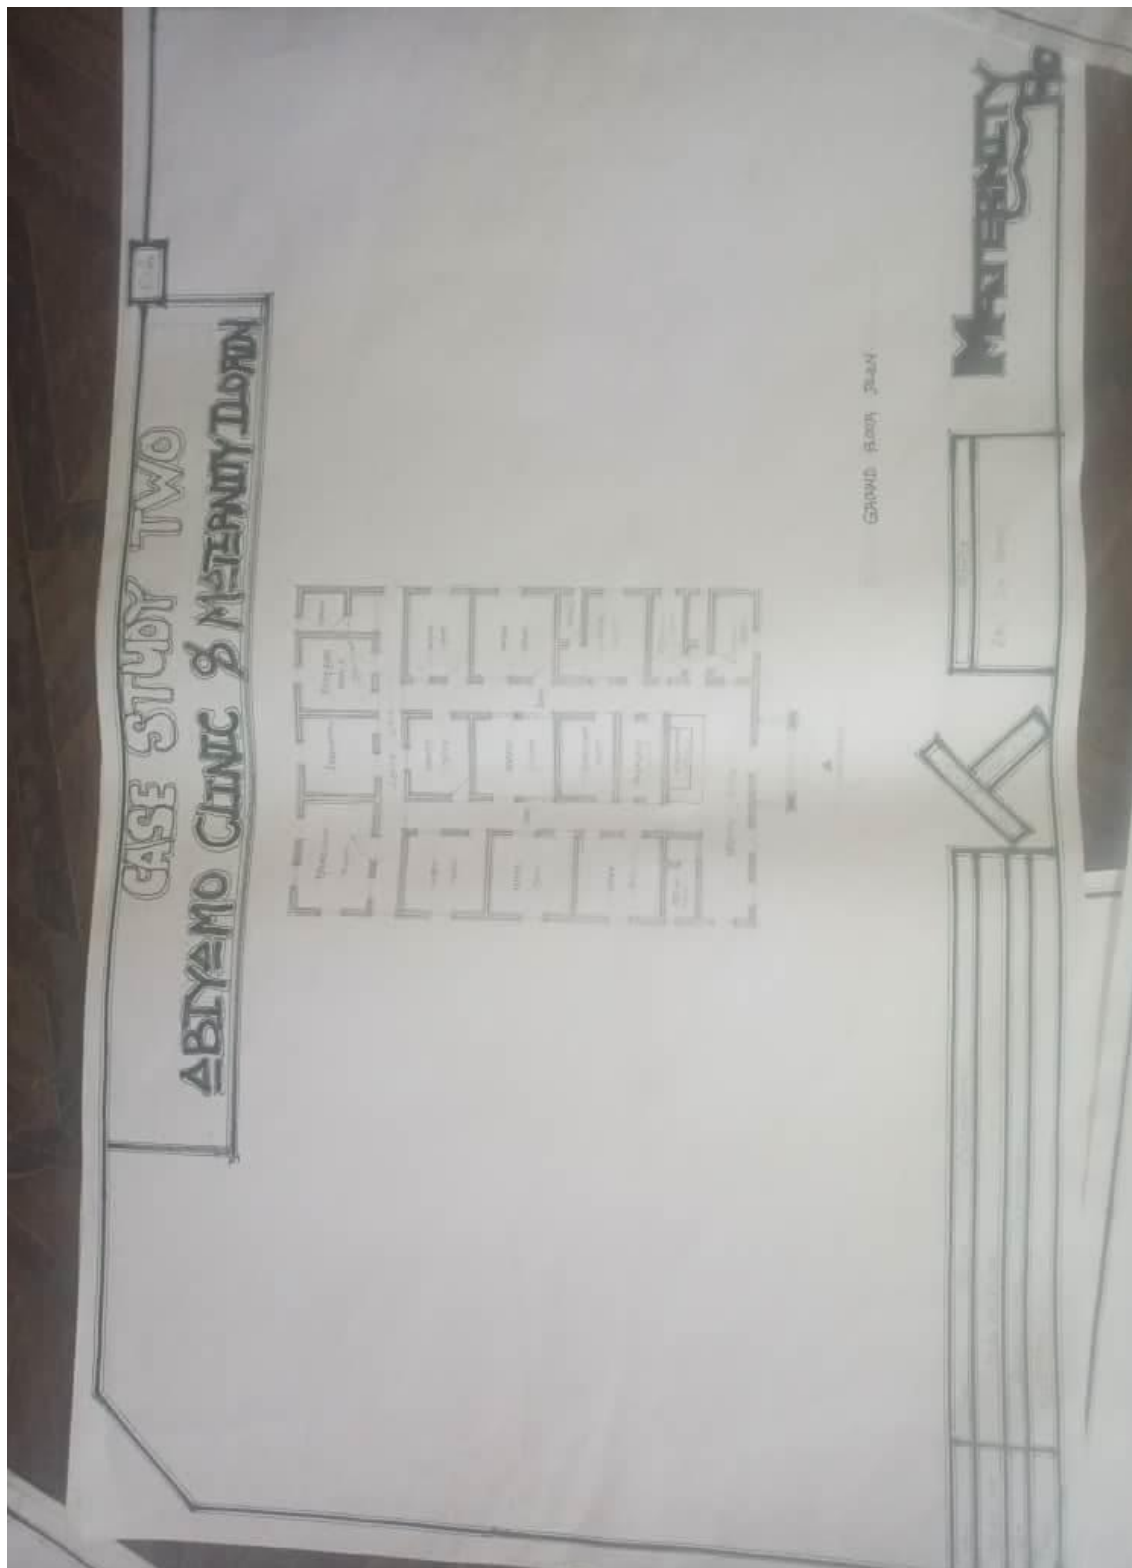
GROUND FLOOR PLAN OF CASE STUDY 2
